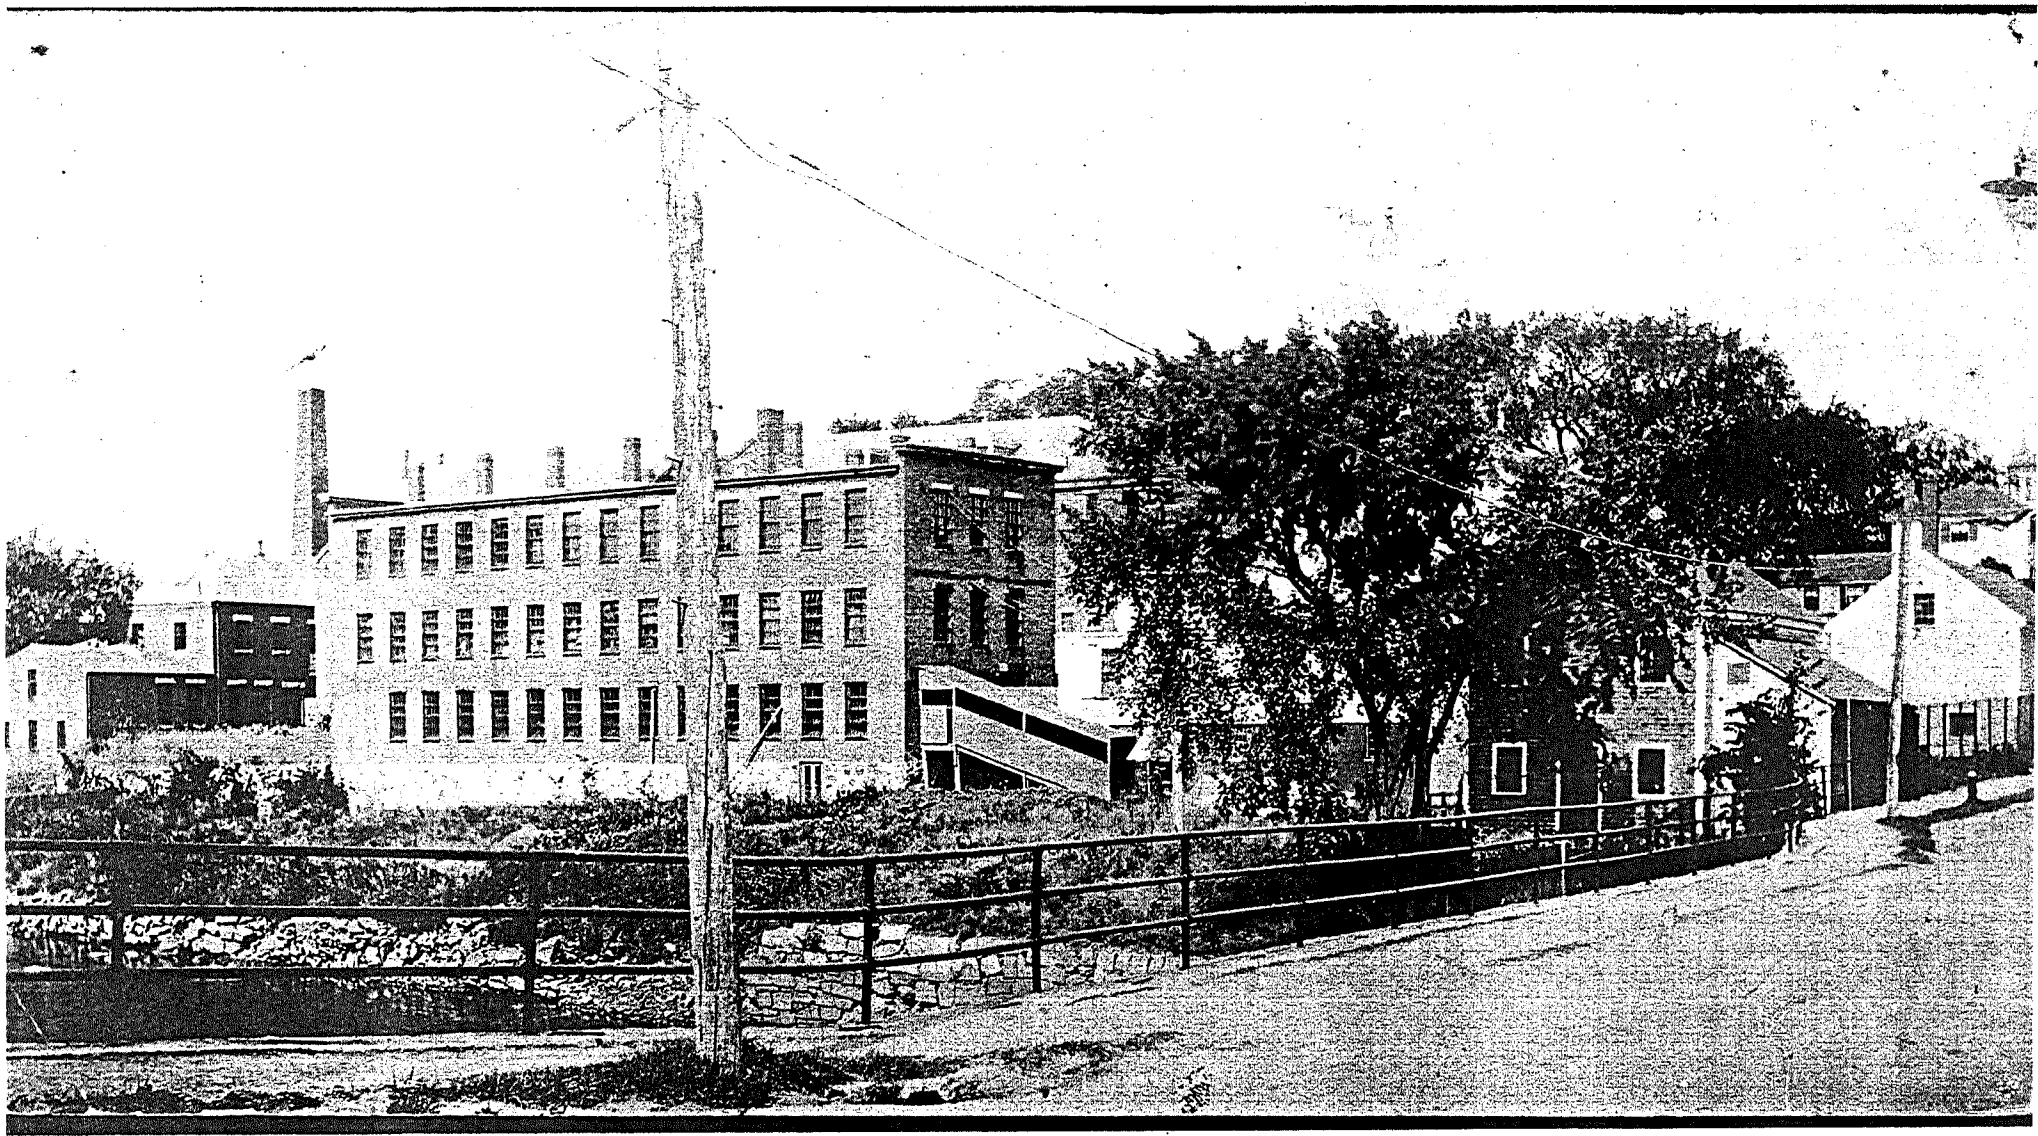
Green Street Bridge and Old Prison Shop, House of Correction. Photo ca.1910 showing detail of original pipe railing. Courtesy of Ipswich Historical Society.
